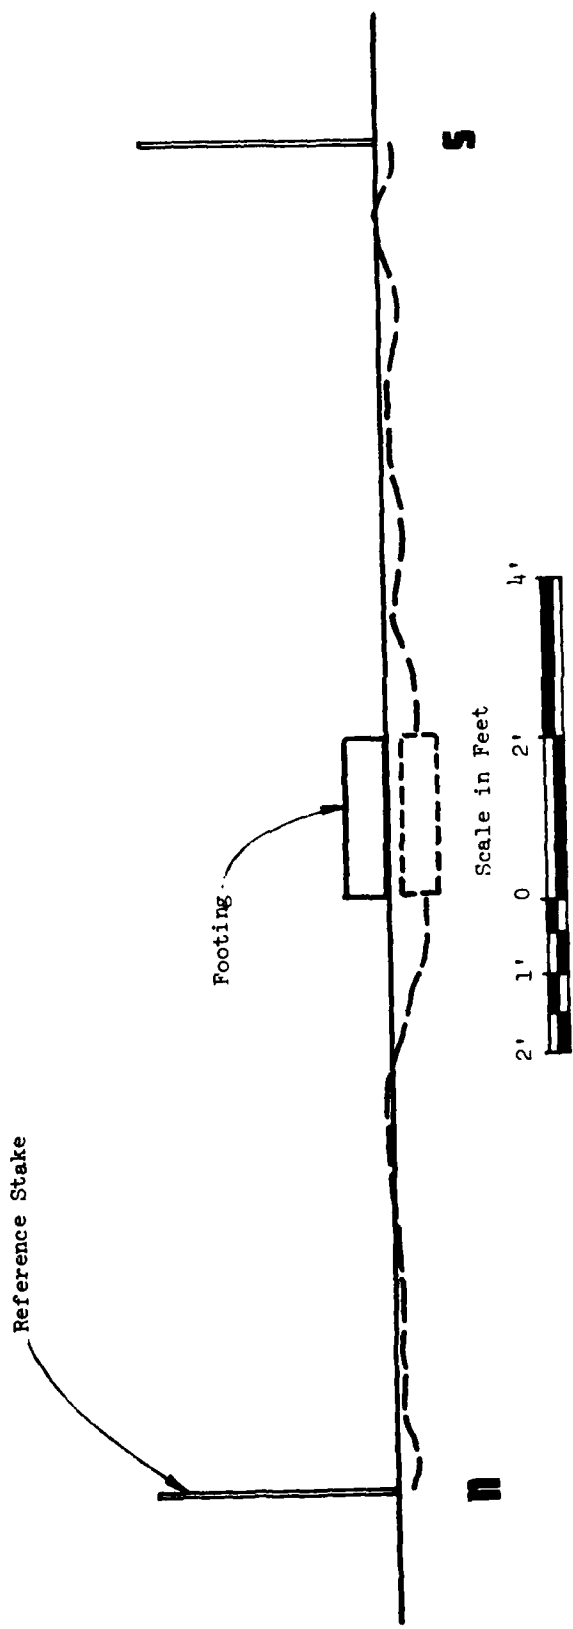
Net Scour at Footing 7 (Unprotected) - North/South View
